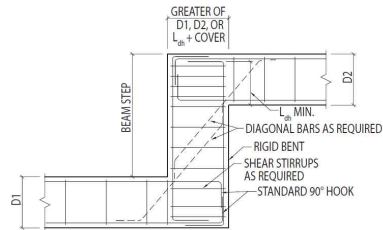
A large step or elevation change in a beam can create a bent
